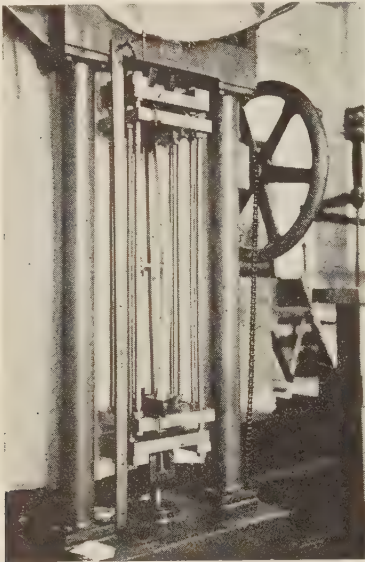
TYPICAL STRUT IN TESTING MACHINE, SHOWING EULER TYPE FAILURE
